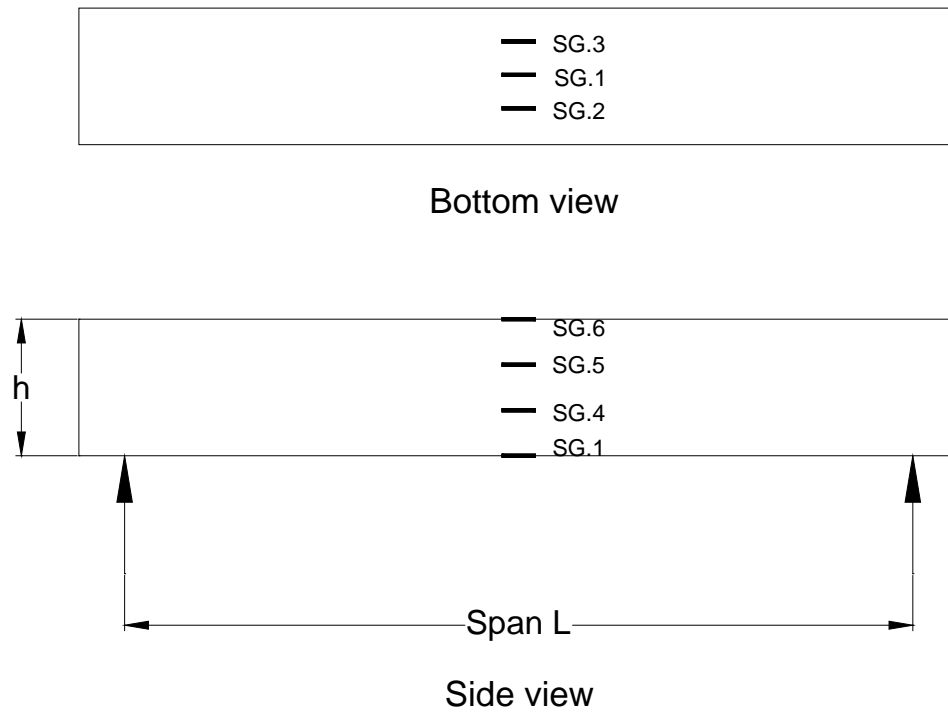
Strain gage locations in the hybrid hollow core test specimens.
